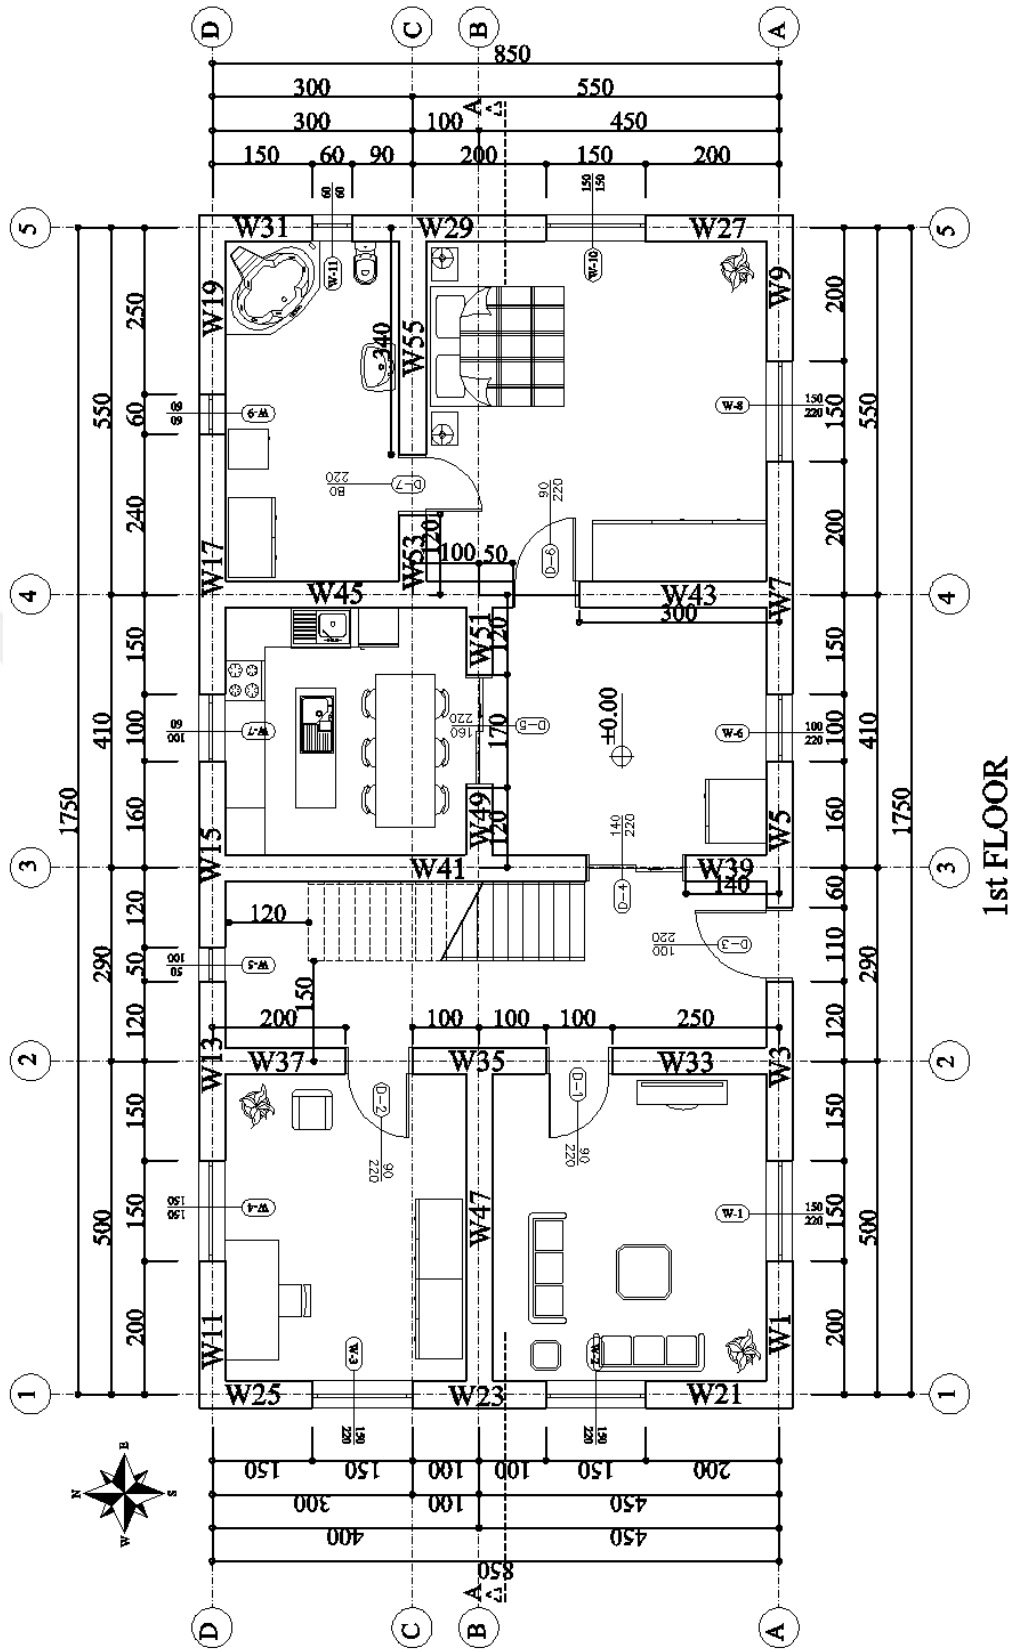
1st Floor Plan (All dimensions are given in cm)
